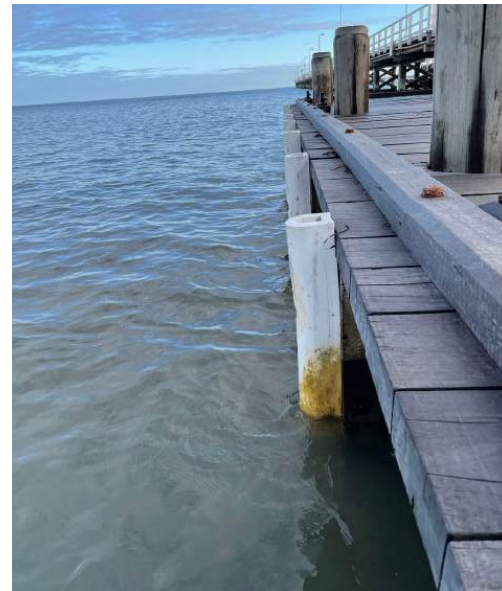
Detail view of fendering to lower platform. H+H Architects, 2022.
